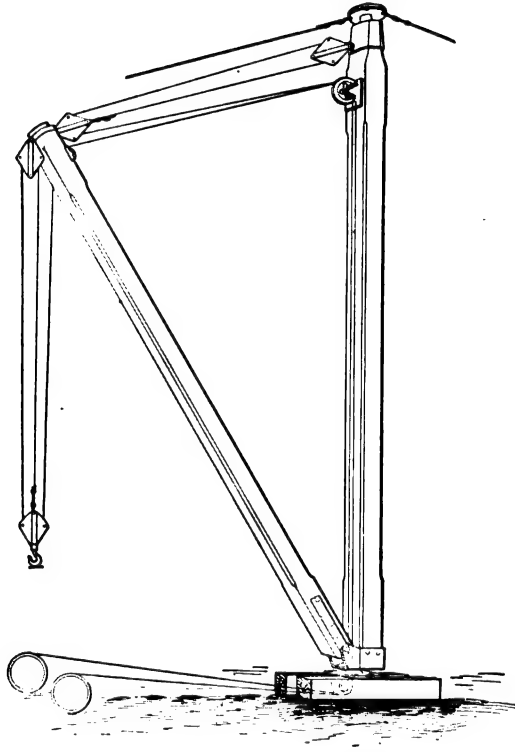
DOUBLE-DRUM GUY DERRICK, AMERICAN HOIST AND DERRICK CO.
